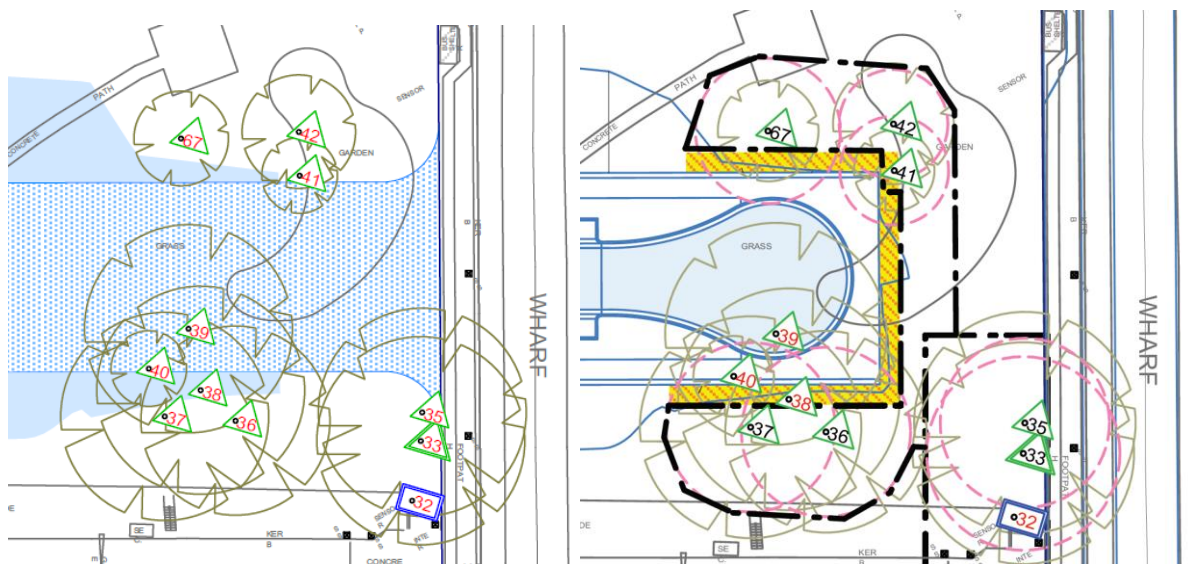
EWR-3 / Wharf Road Interface. Original proposal – EWR-3 connecting to Wharf Road – on left (resulted in loss of 10 category A/AA trees). Revised proposal – cul-de-sac of EWR-3 short of Wharf Road – on right (results in loss of only 3 A trees)
